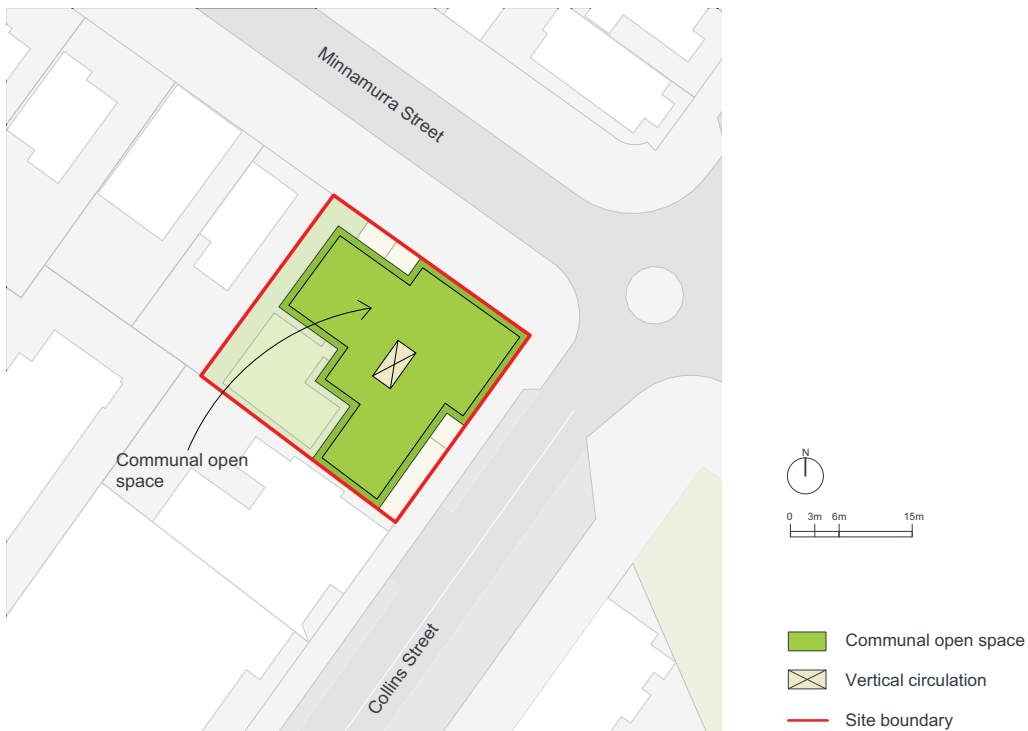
Corner site at Minnamurra & Collins St - Rooftop Plan
